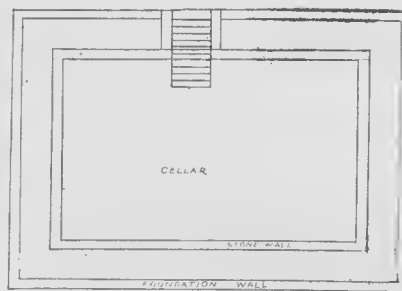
Plan of Cellar, showing cellar wall inside foundation wall.
